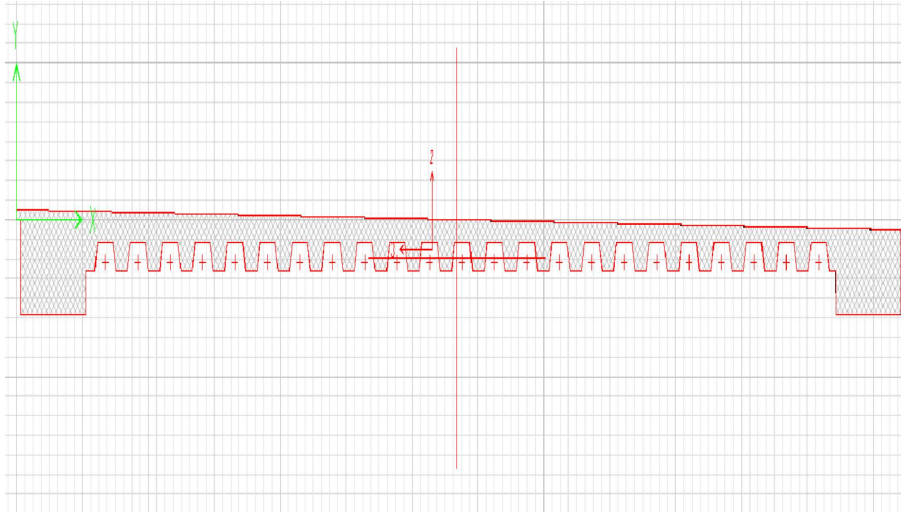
Steel-concrete composite section in zone D' of the cycle deck.
